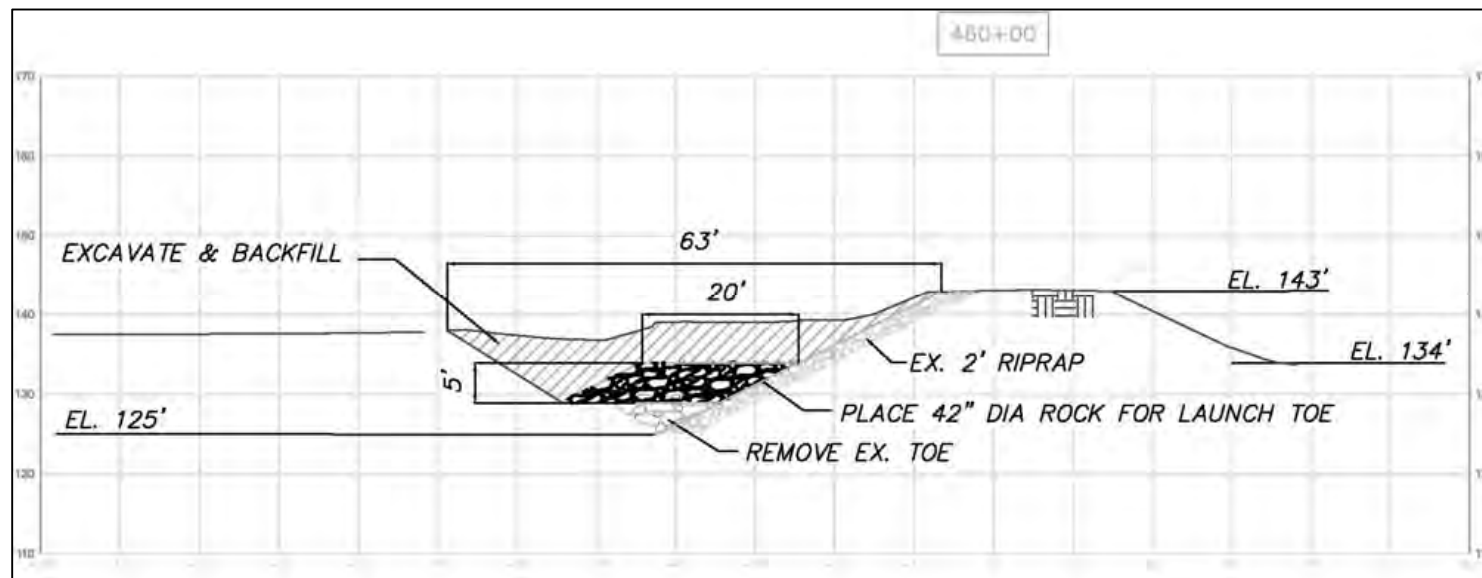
Typical Cross Section of Measure 11, Failure Reach 3
